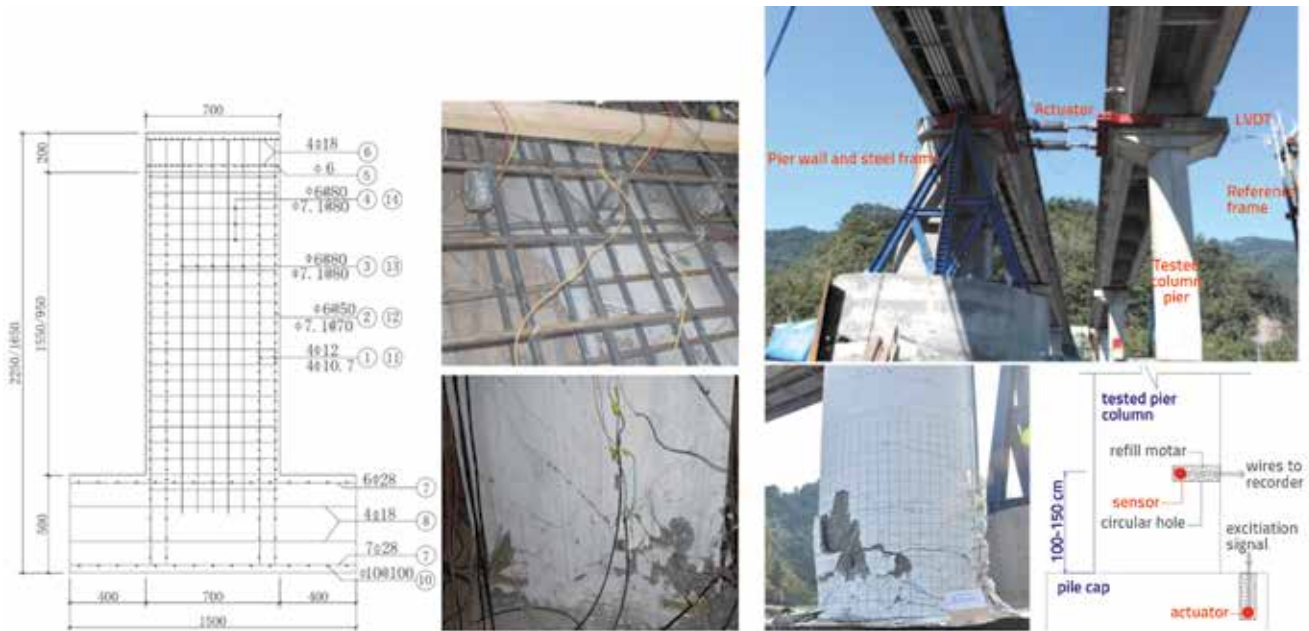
Implementation of smart aggregate for damage detection: Monitoring of reinforced concrete shear walls [30] (left); Monitoring of Niu-Dou Bridge, Taiwan (right) [28]
